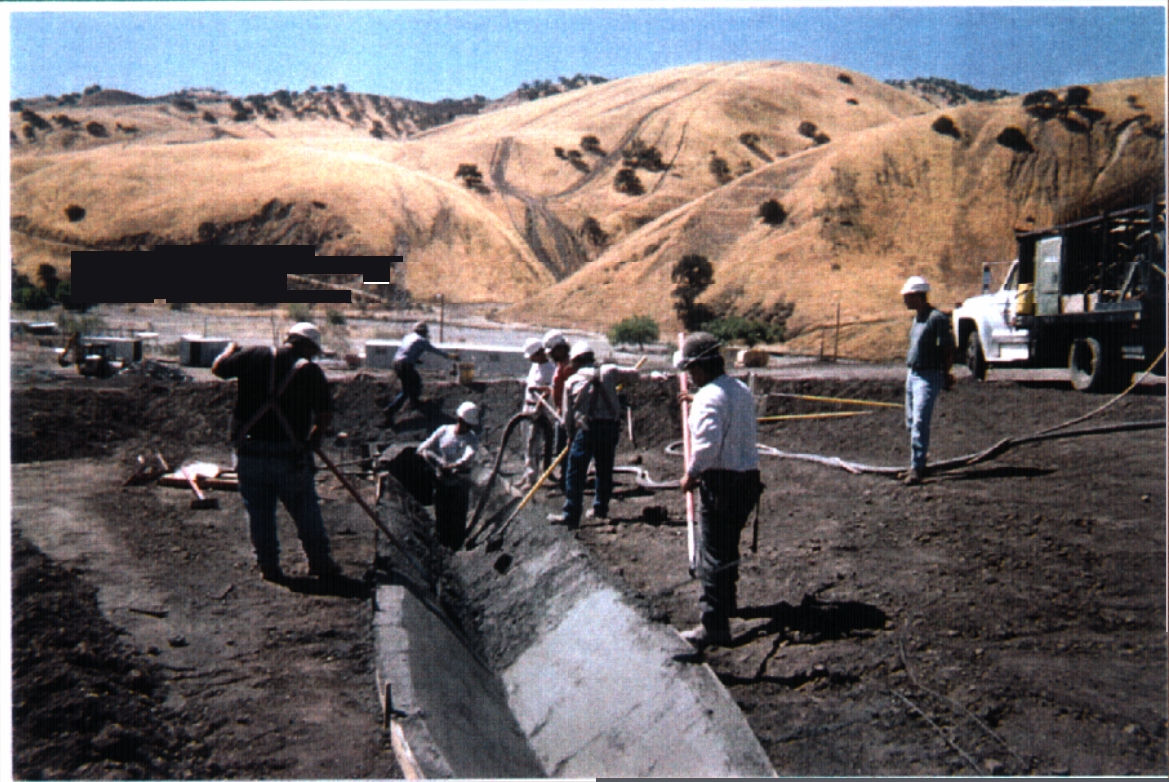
Shooting and finishing of shotcrete lined V-ditches.
